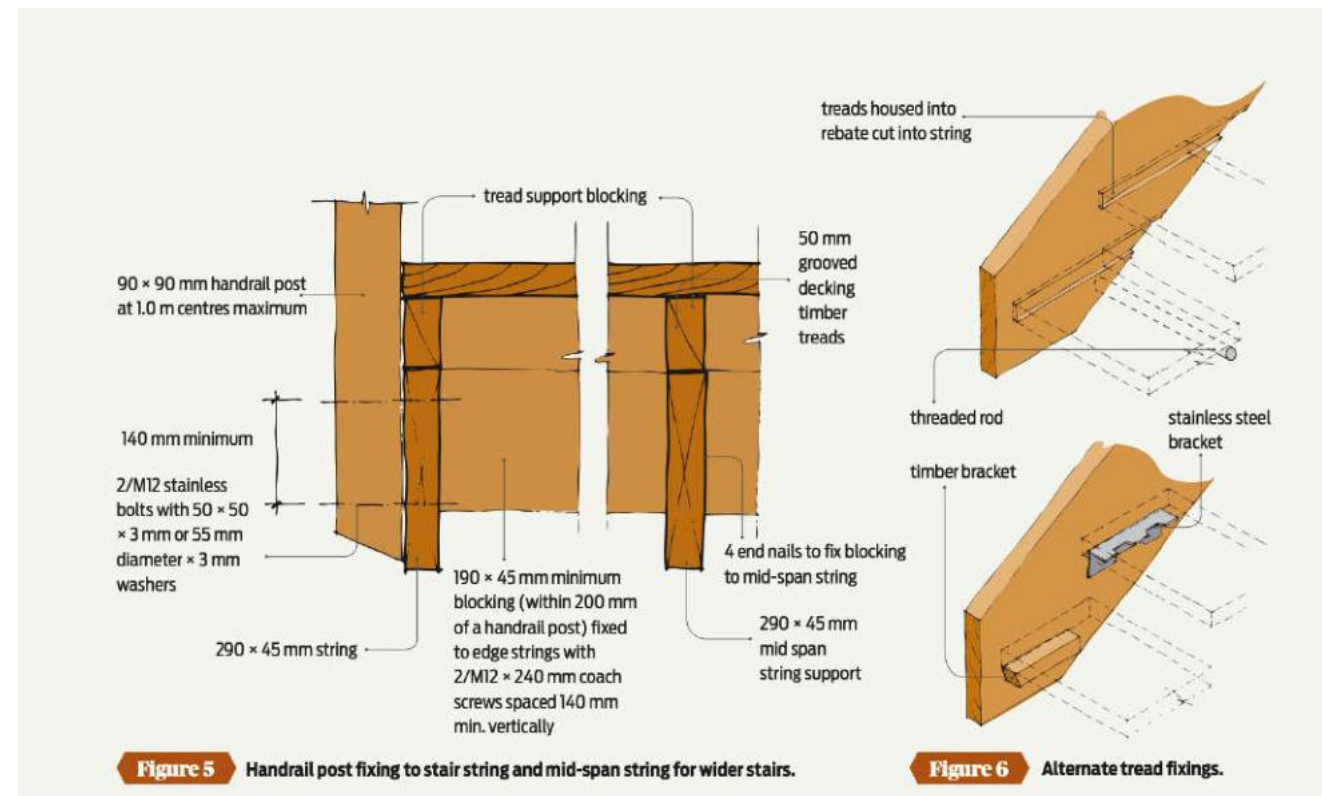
Handrail post fixing to stair string and mid-span string for wider stairs.
